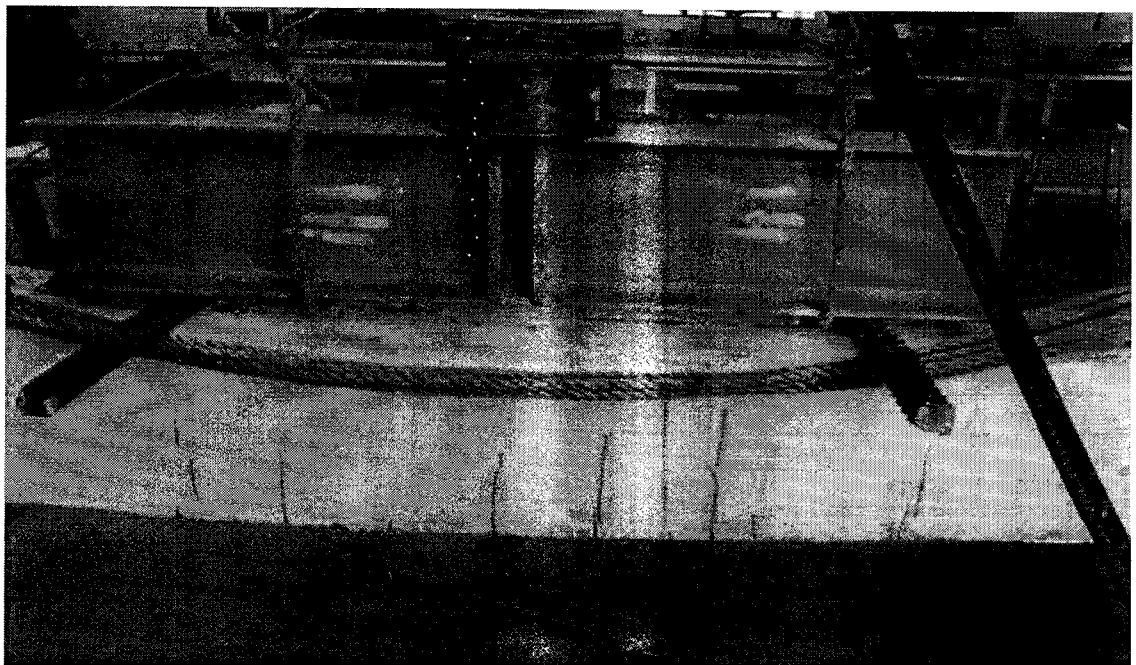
Typical failure of beam with 1 layer of woven rovings 1(A)
